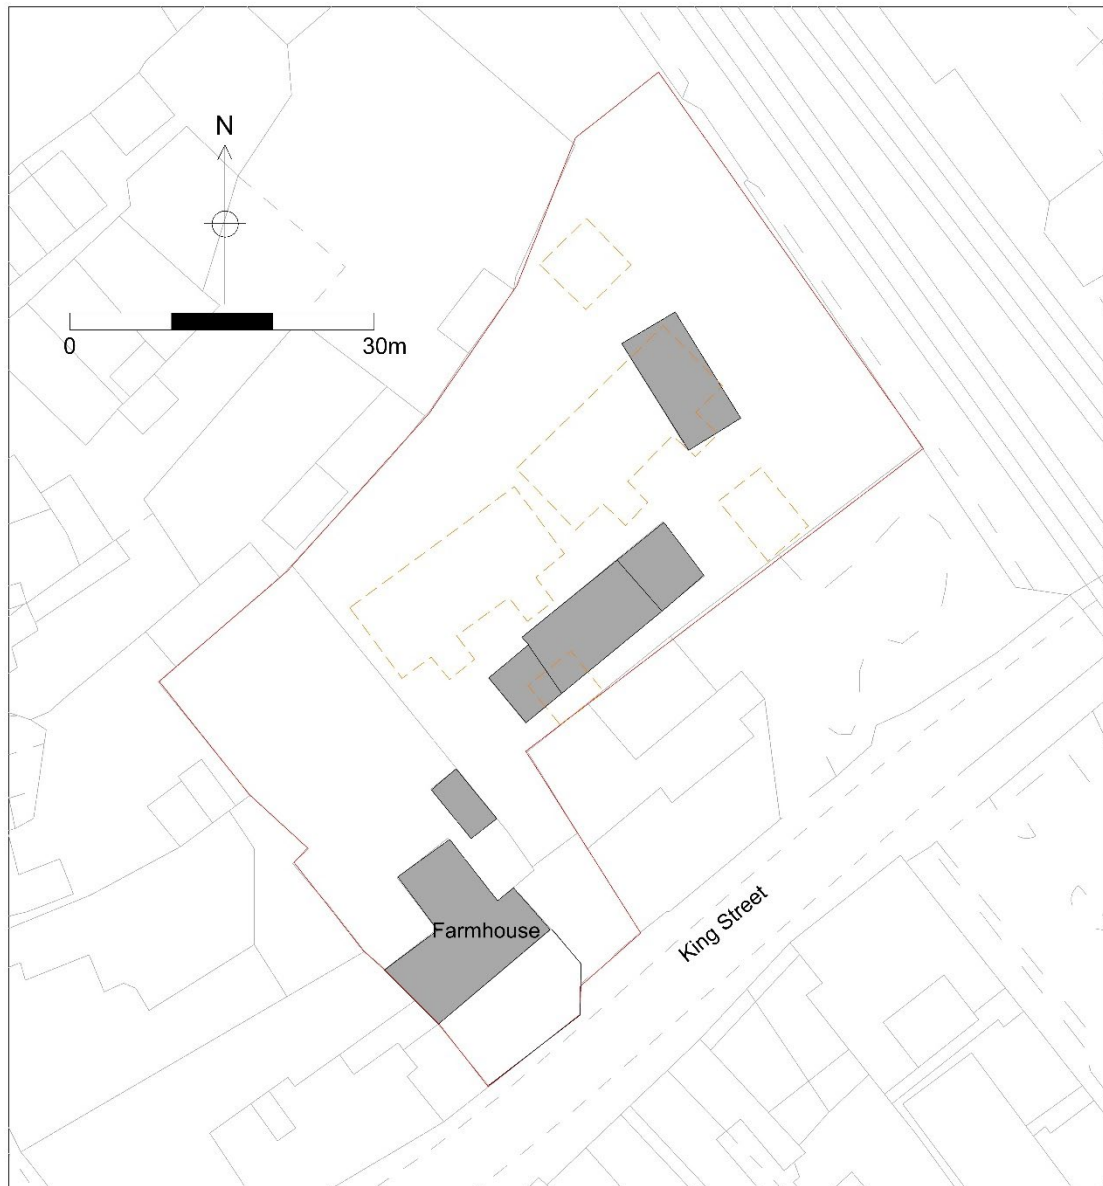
Detailed site plan, showing current upstanding buildings (shaded grey) and area of proposed development (dashed orange lines)
